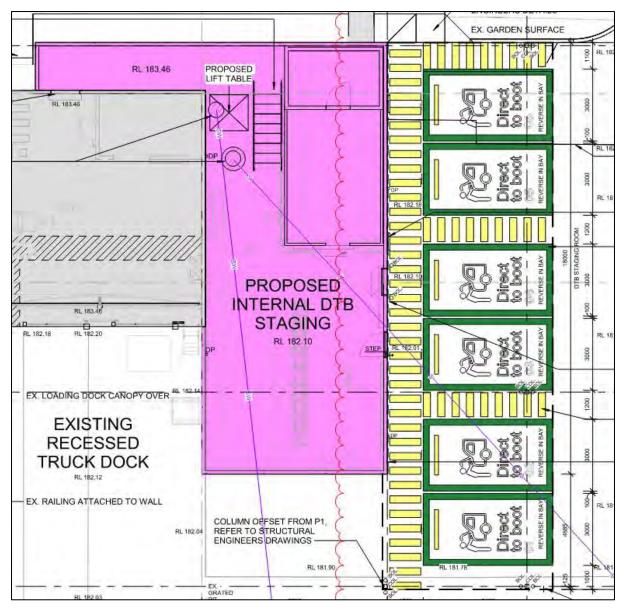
Excerpt of the Proposed Floor Plan showing the configuration of the proposed internal staging area and car park canopy.
